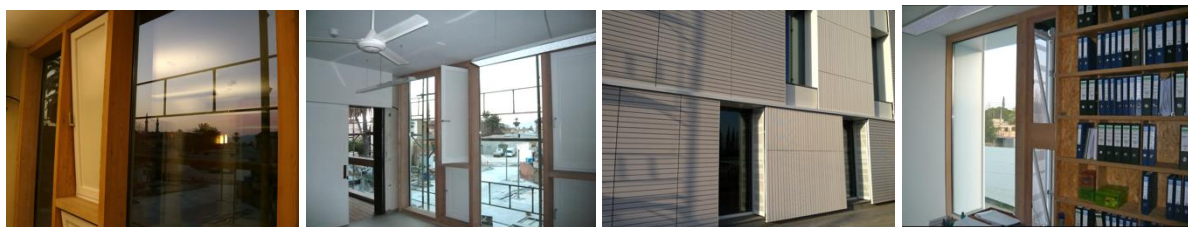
Tilted north façade vent, north façade open right, south window from outside, south vent from inside.
